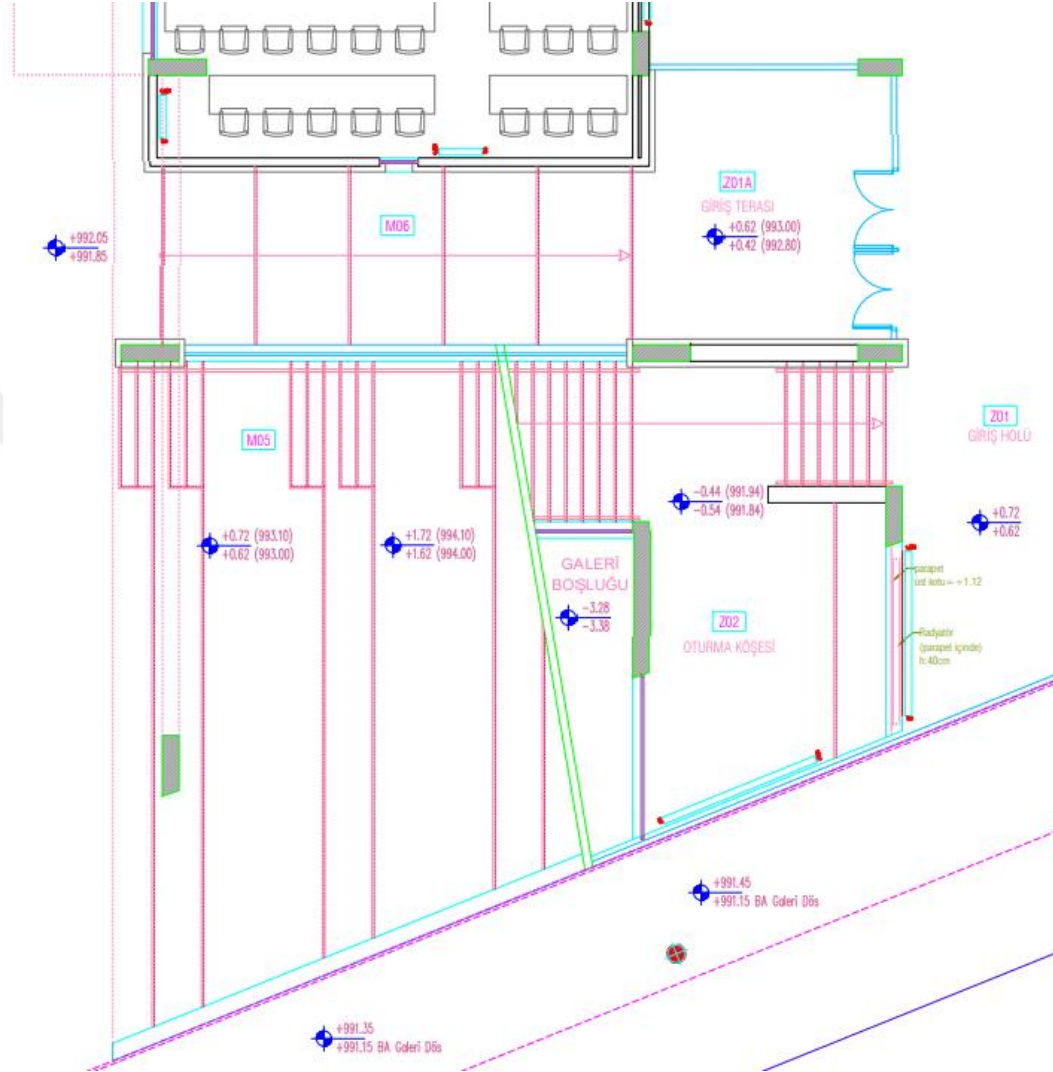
On the ground floor, the gallery area and the seating area corner plan are positioned on the south facade
